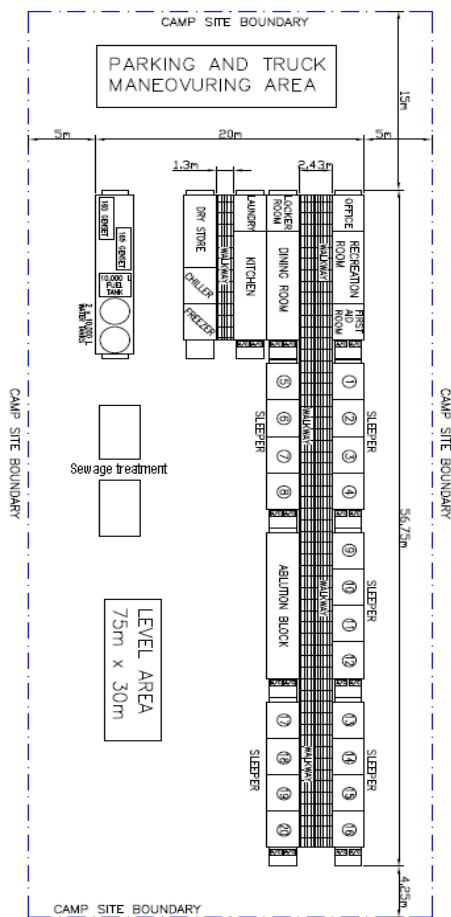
General site layout illustrating potential temporary camp and associated equipment.
